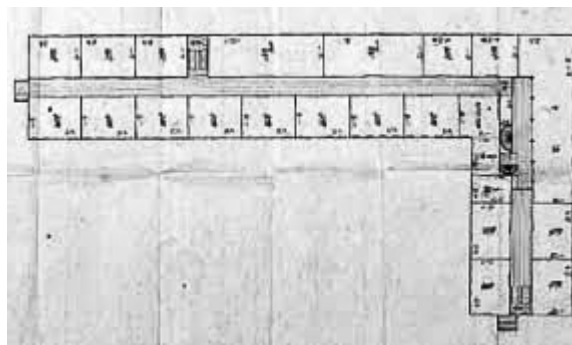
Second floor plan of Kaichi Primary School (1876)
